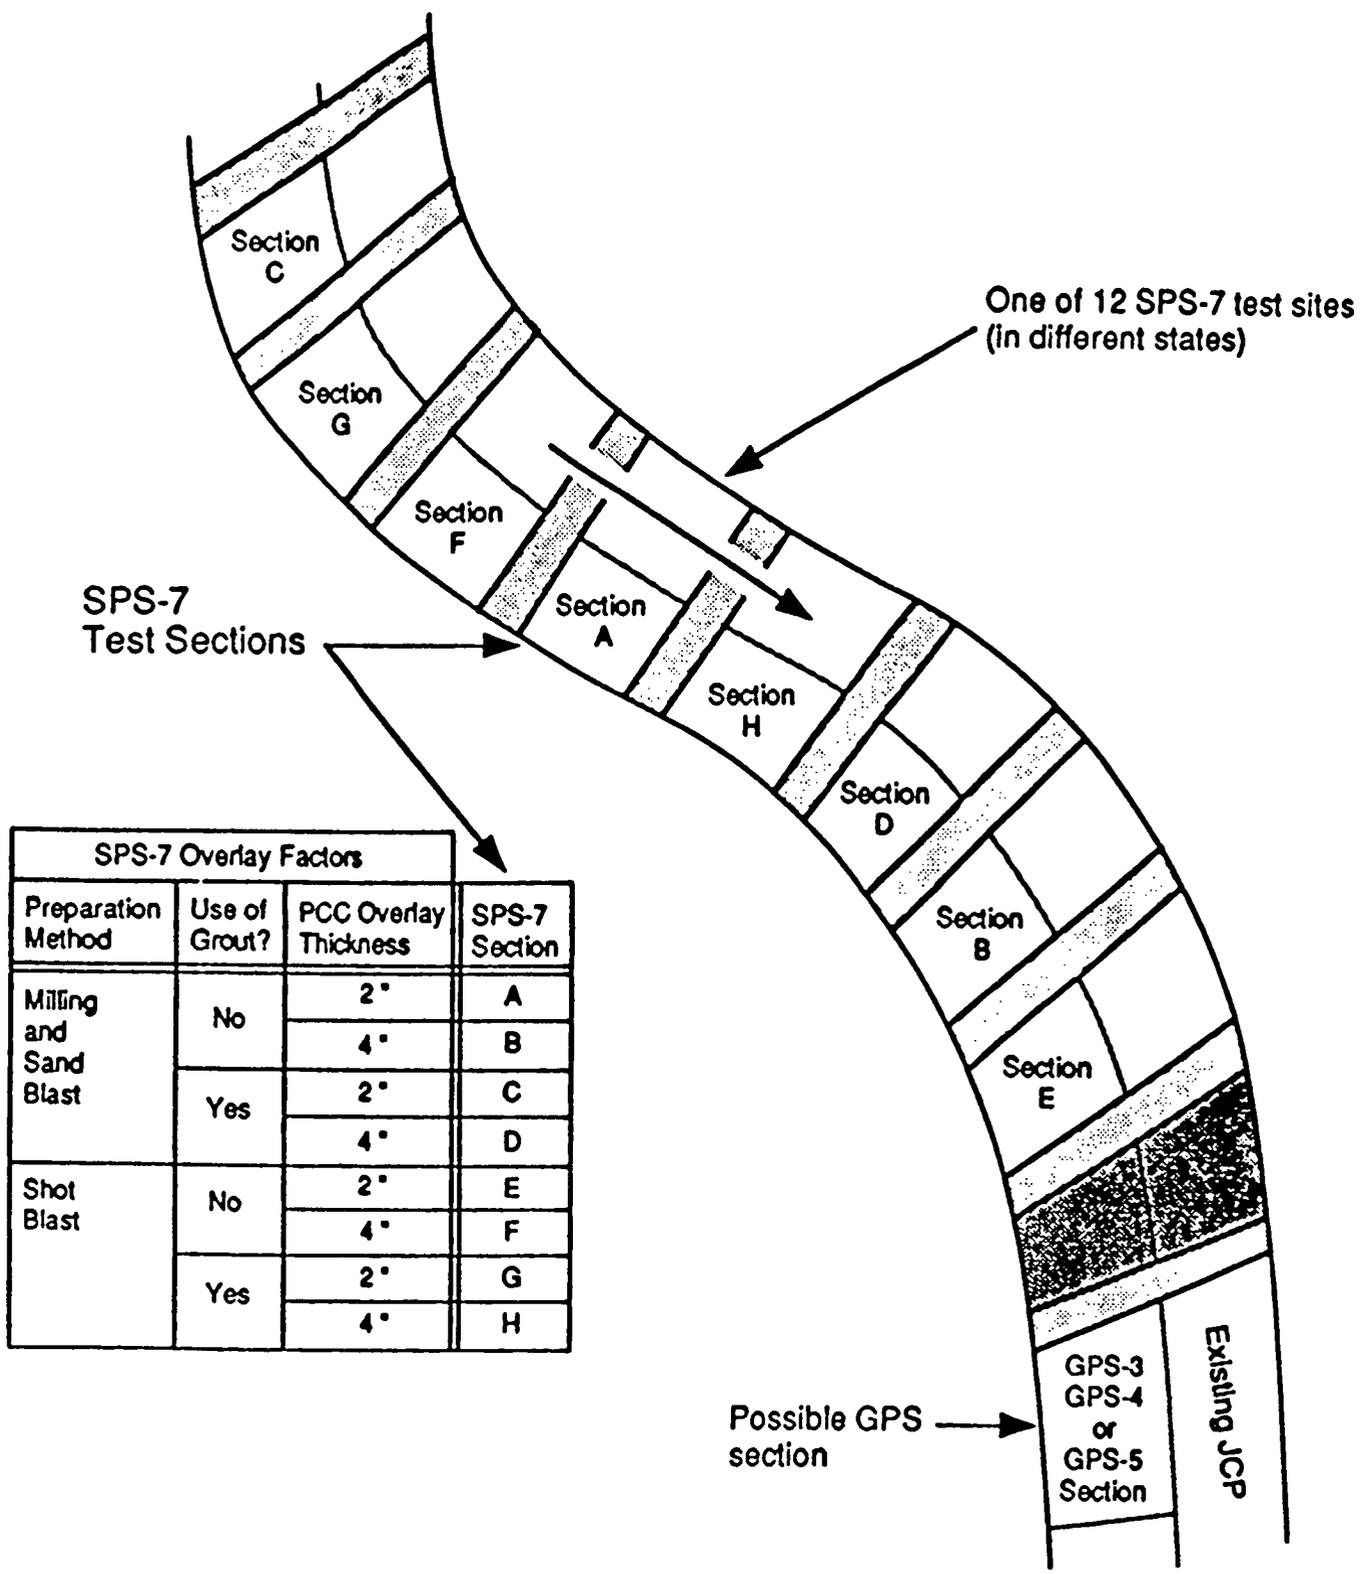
Test Section Layout for SPS-7: Bonded PCC Overlay of PCC Pavements
